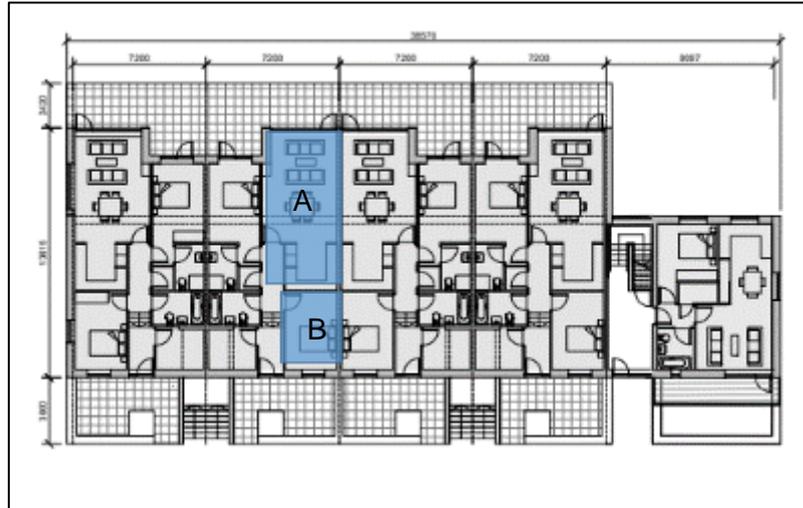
Block B – Ground Floor Assessed Rooms Highlighted in Blue
